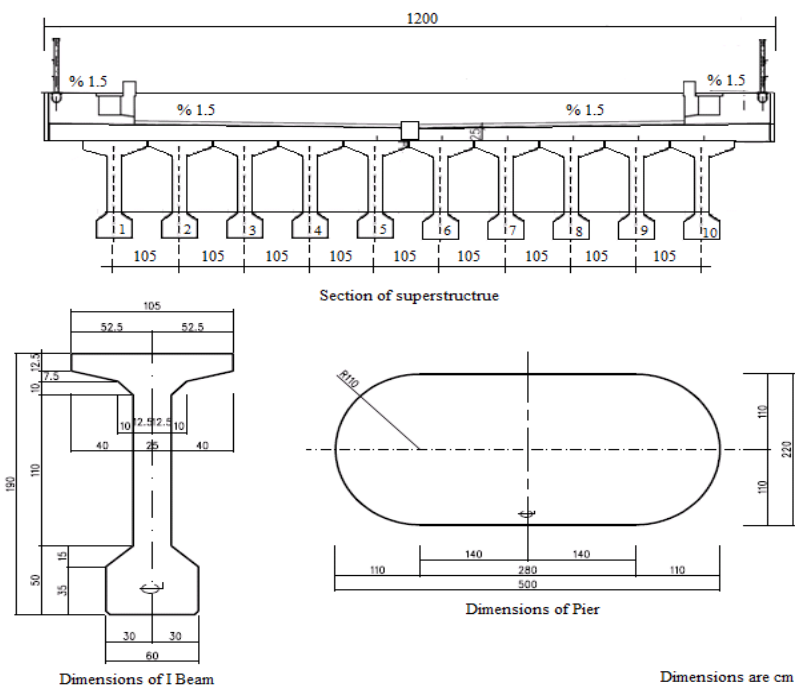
Section of superstructure, dimensions of I beam, and dimension of piers of the bridges
